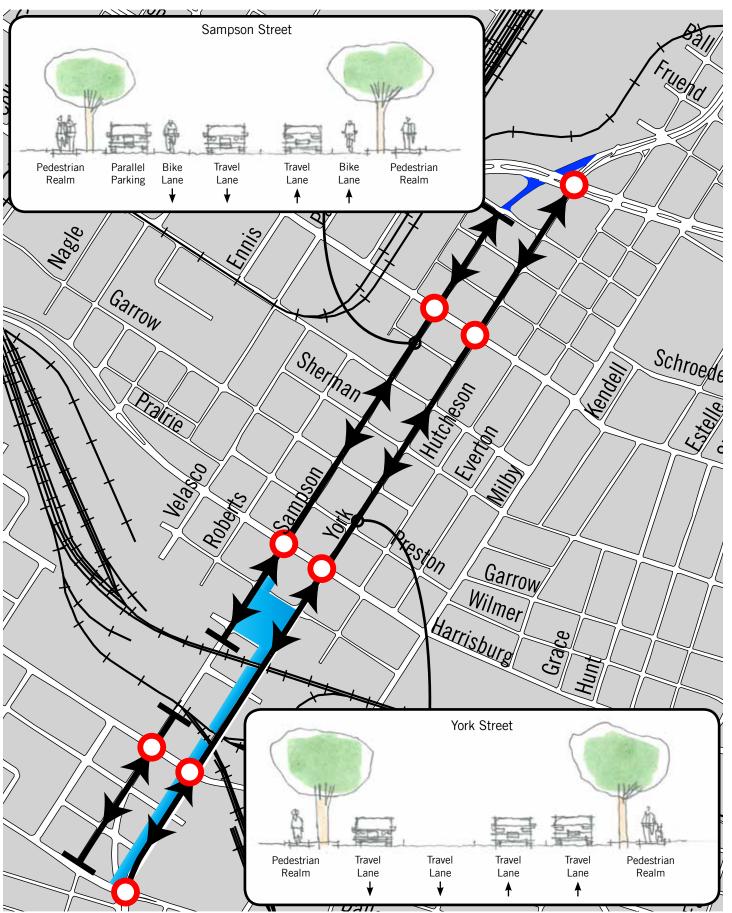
Potential Sampson Street and York Street Two-way Operation
